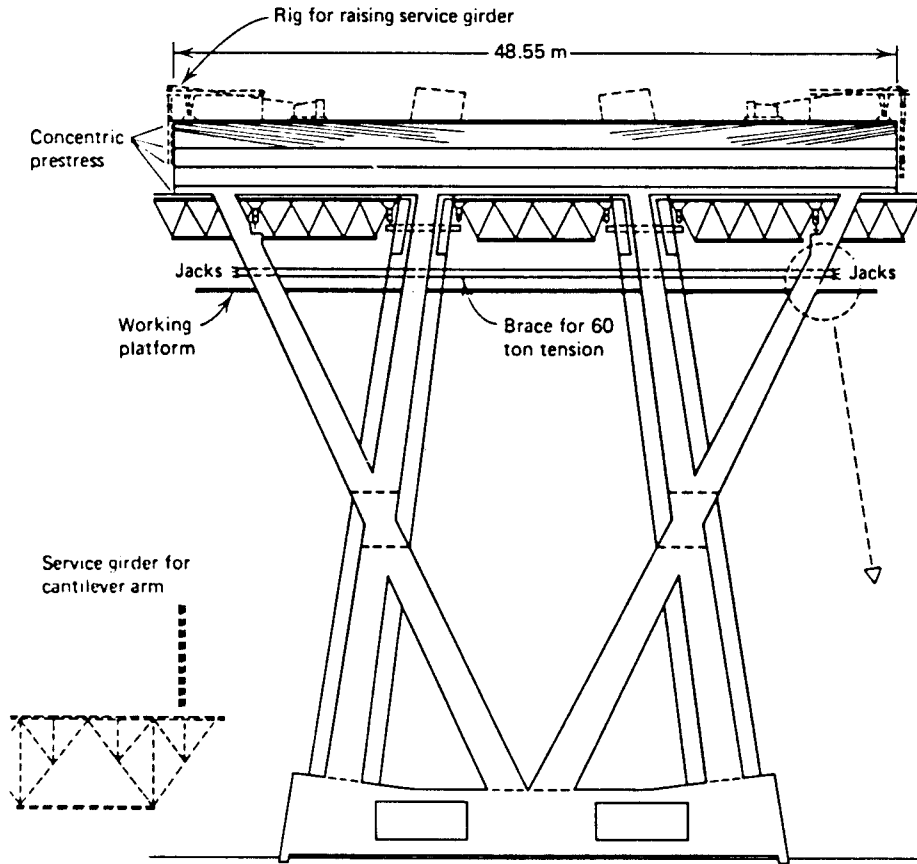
Lake Maracaibo Bridge, main span tower and X-frames.
